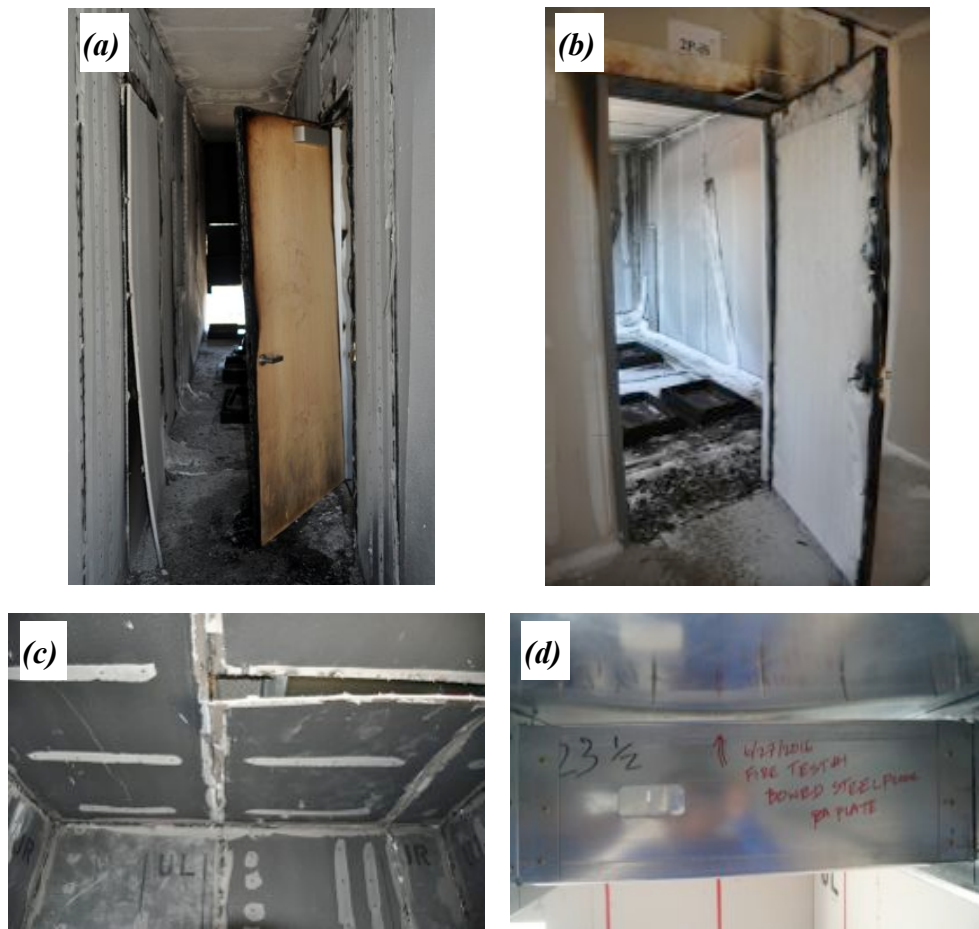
Damage to the test building following the fire tests: (a) level 2 corridor, (b) partially detached door, (c) partially detached gypsum ceiling, and (d) sagging floor system at the second floor.
